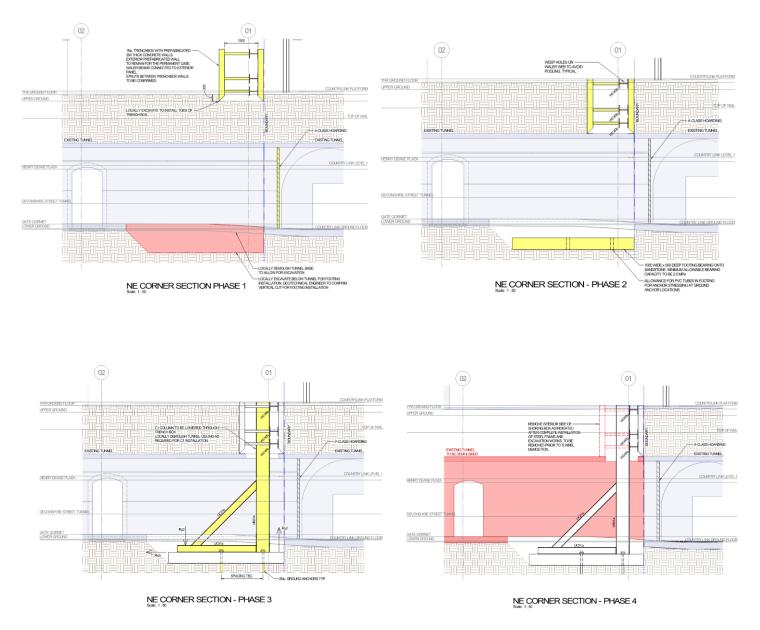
North-East Baggage Tunnel Temporary Retention & Demolition
